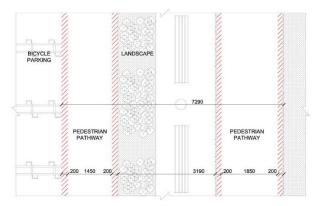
Street width and buffer spaces (in mm) for Gateway 3 in the area surrounding Darmstadt Hauptbahnhof
